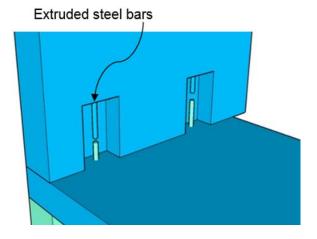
Connections between steel reinforcement bars from the lower and upper panels
